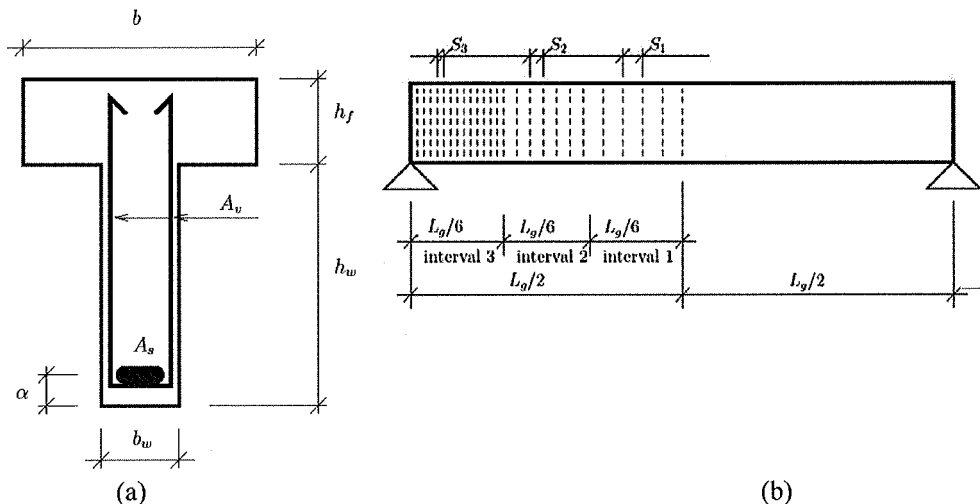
Example reinforced concrete girder: (a) cross section, (b) side view with shear reinforcement.
